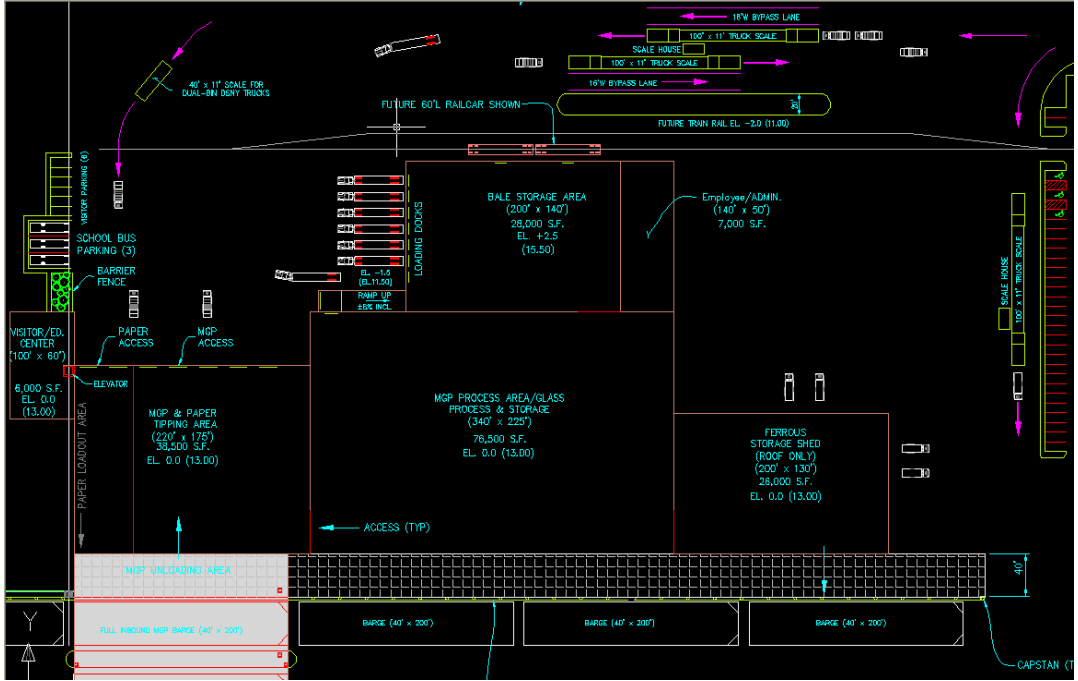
The proposed facility’s layout (MGP building on the left, and the scrap metal building on the right).
